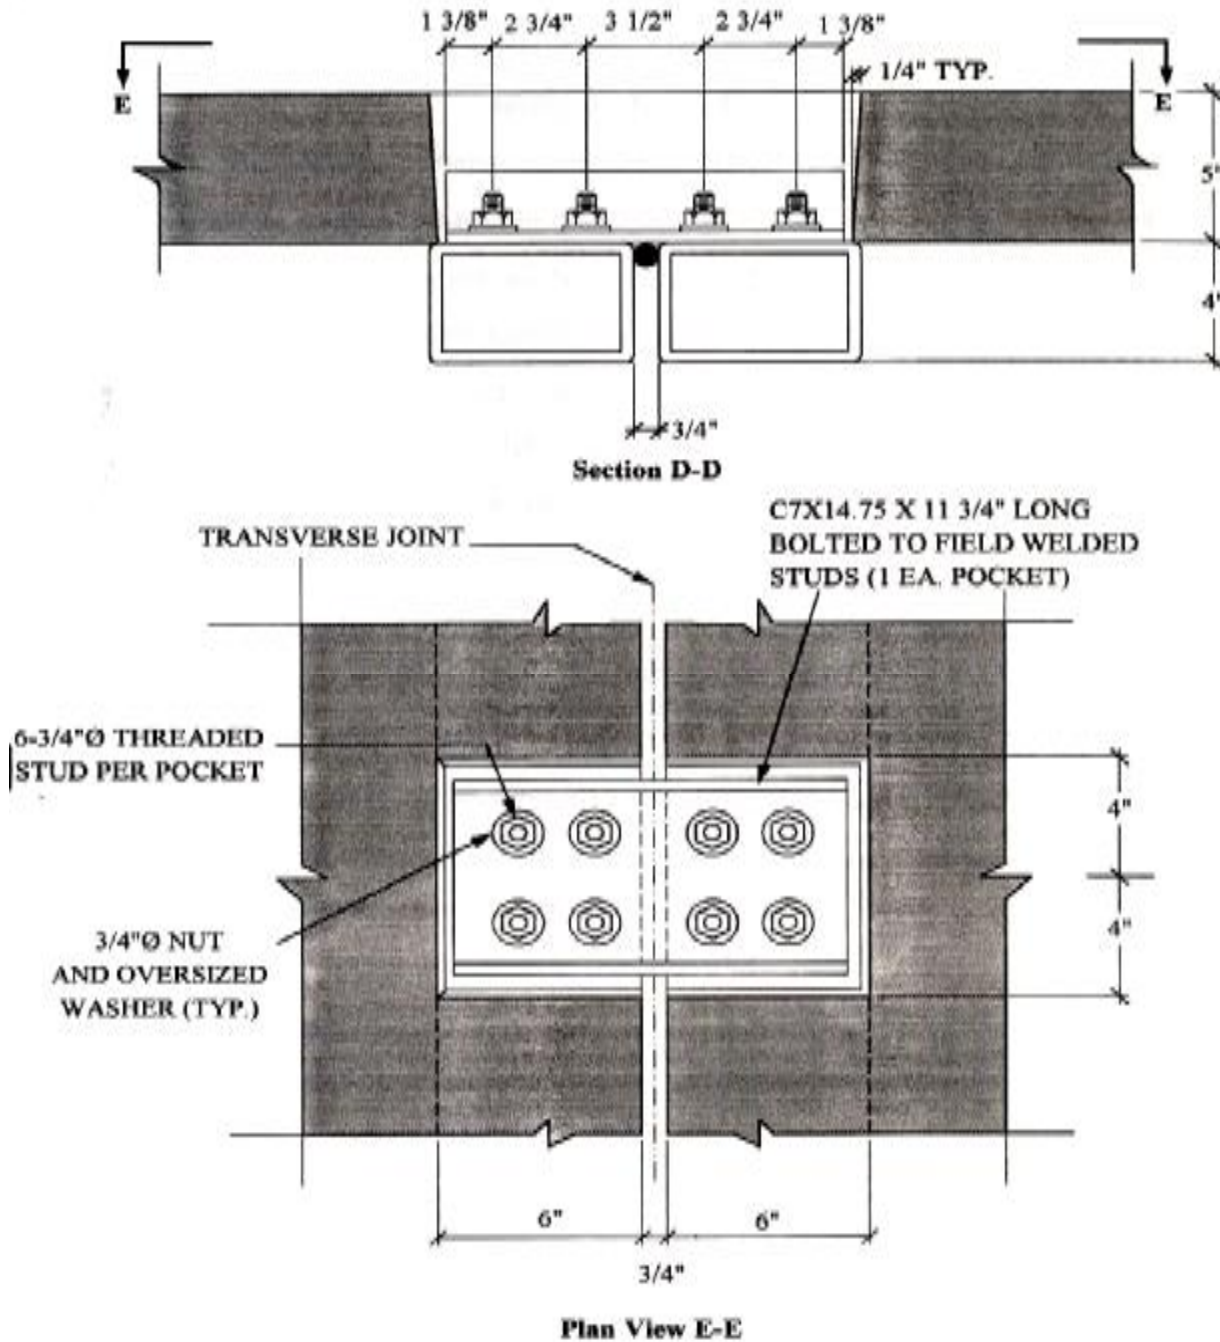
Transverse panel-to-panel connection of the Effideck system
